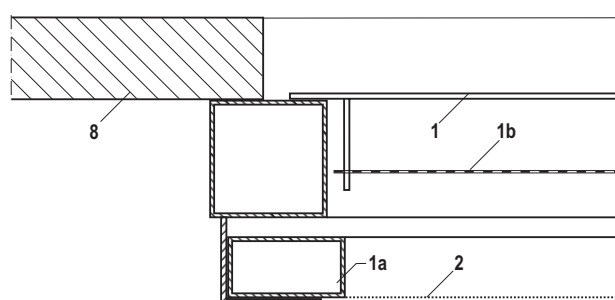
Air outlet housing 1 built onto ceiling, false ceiling 8 placed around air outlet housing
